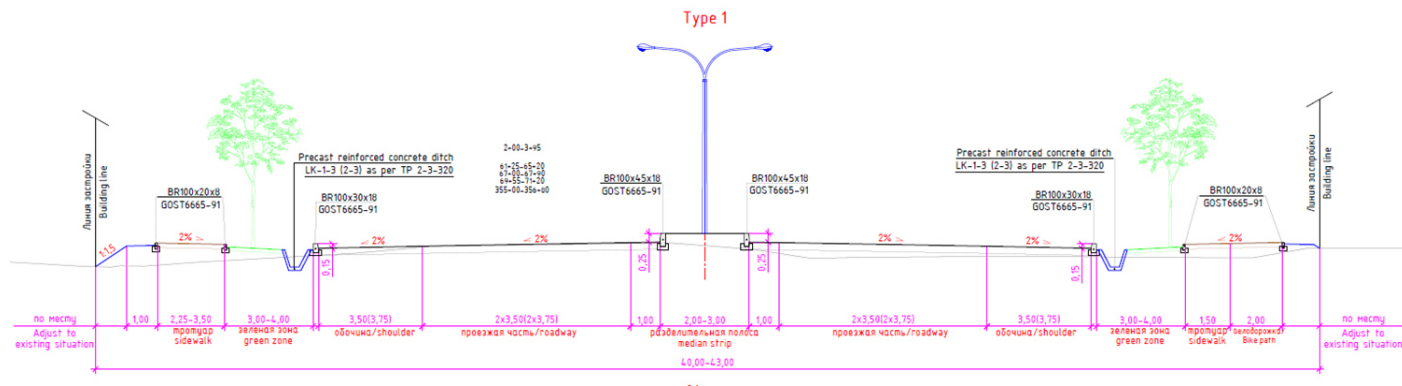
Typical cross section in settlement area with local road (4 lanes plus local road)
